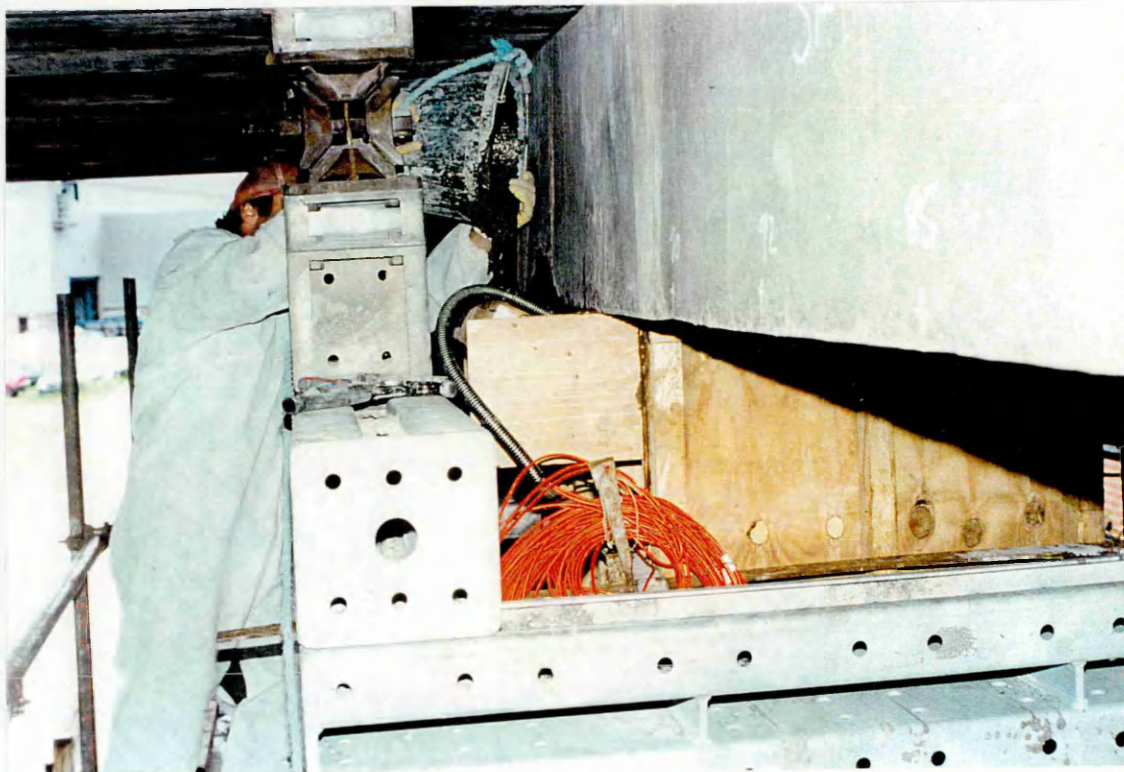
Application of material S2 by pouring into a compression member repair at Sutherland Street Bridge
